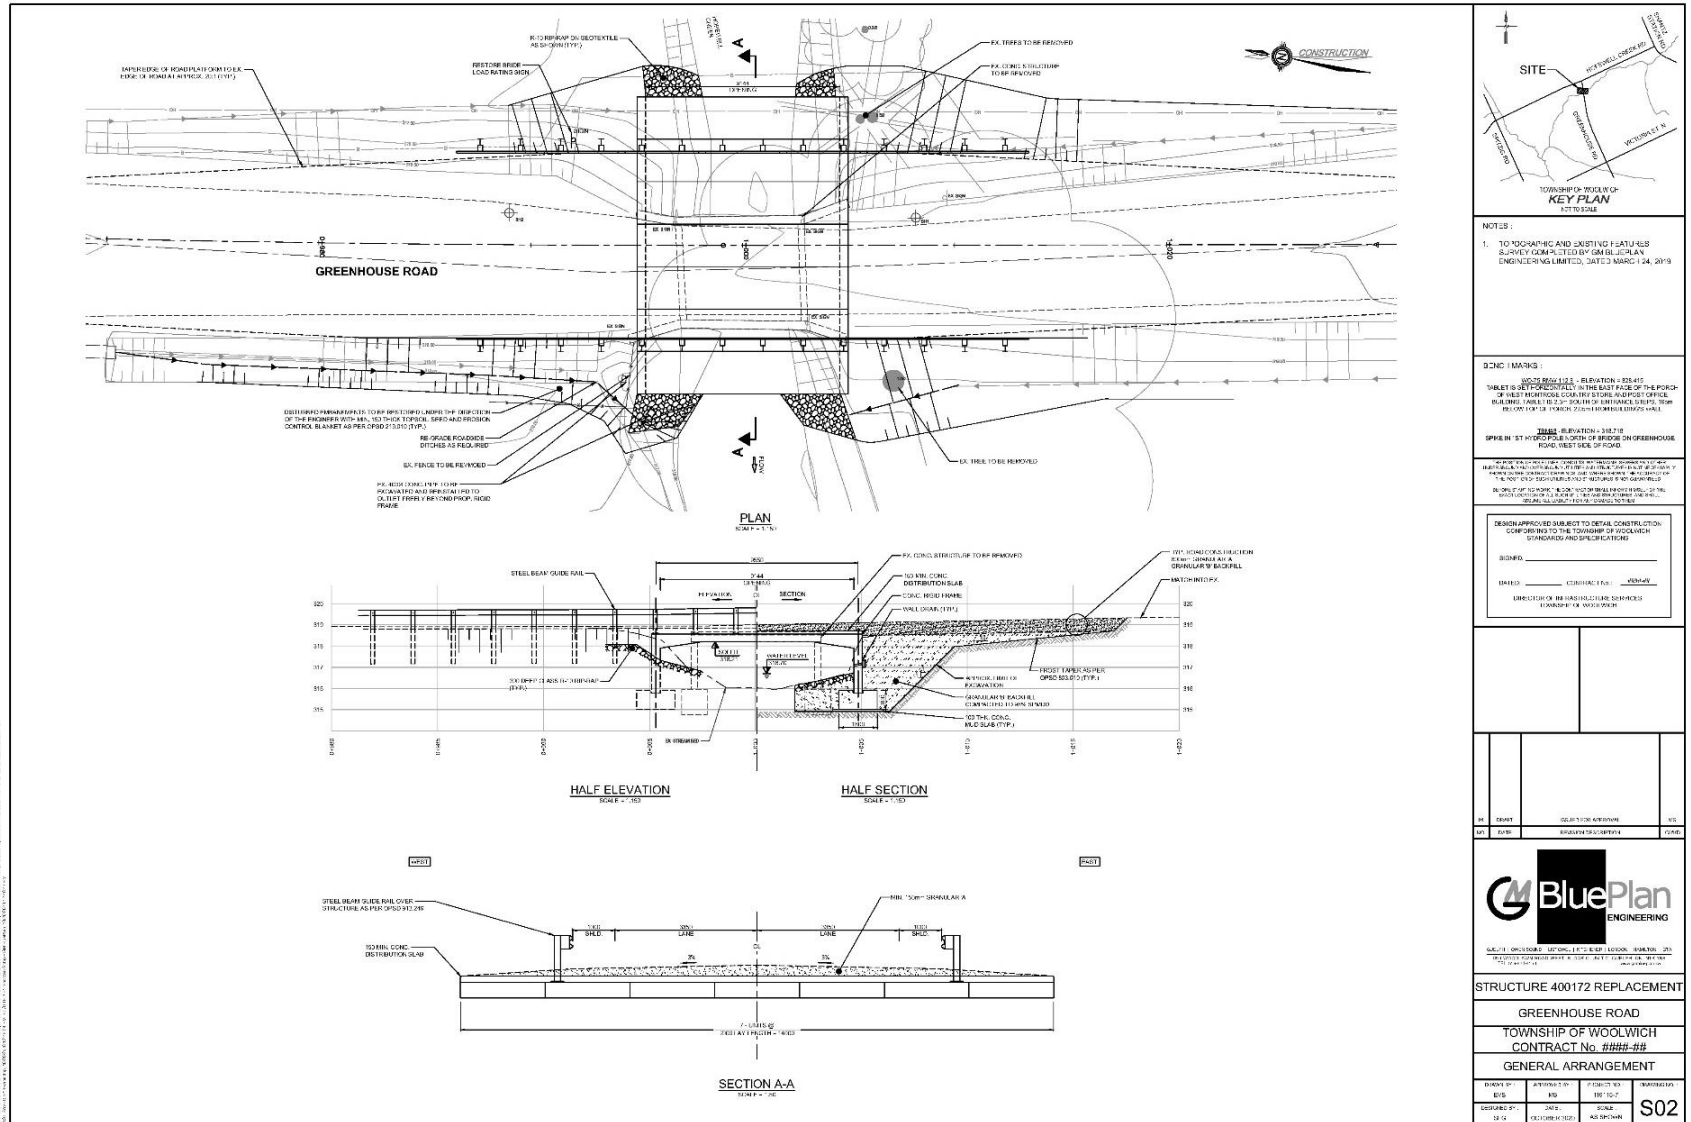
Structure 400172 Replacement, General Arrangement Drawing
